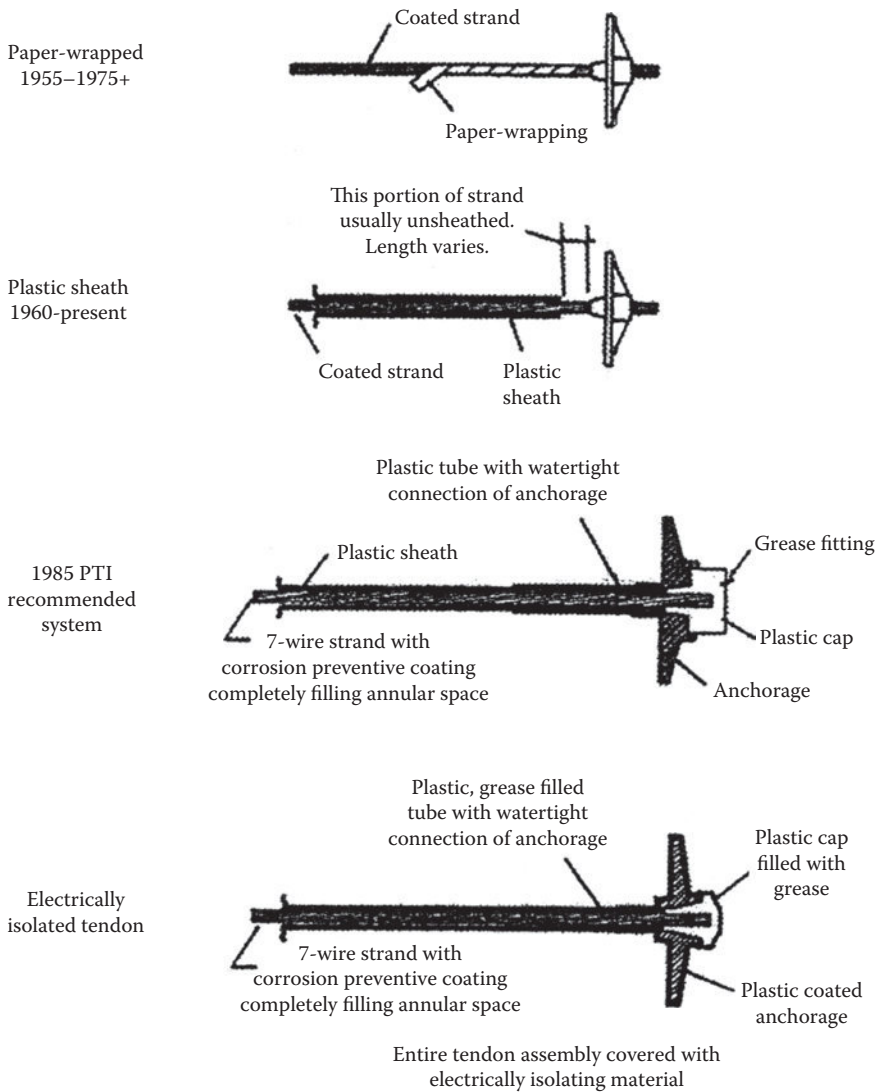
Evolution of corrosion protection for unbonded strand tendons for buildings.
